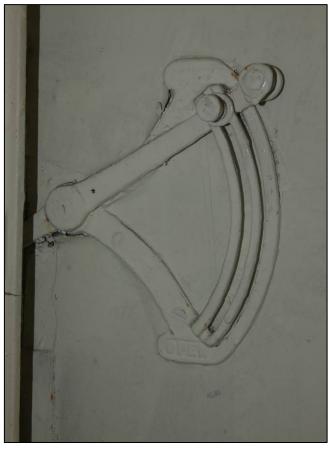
North-west waiting room (GF3), vent opening mechanism to west wall, looking W (photo 941).
